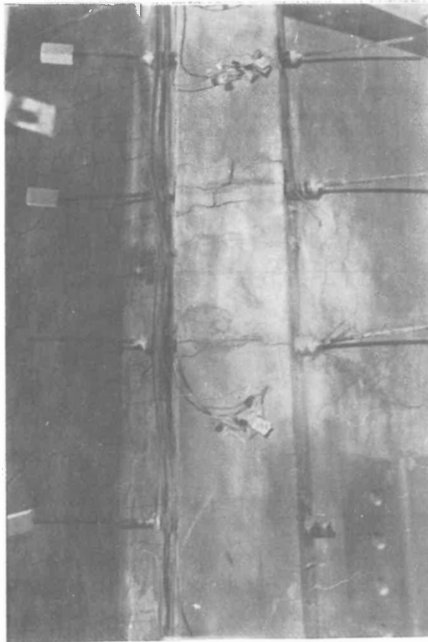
Cracking at Tendon Anchorages in Southwest Buttress at 135 psi.
